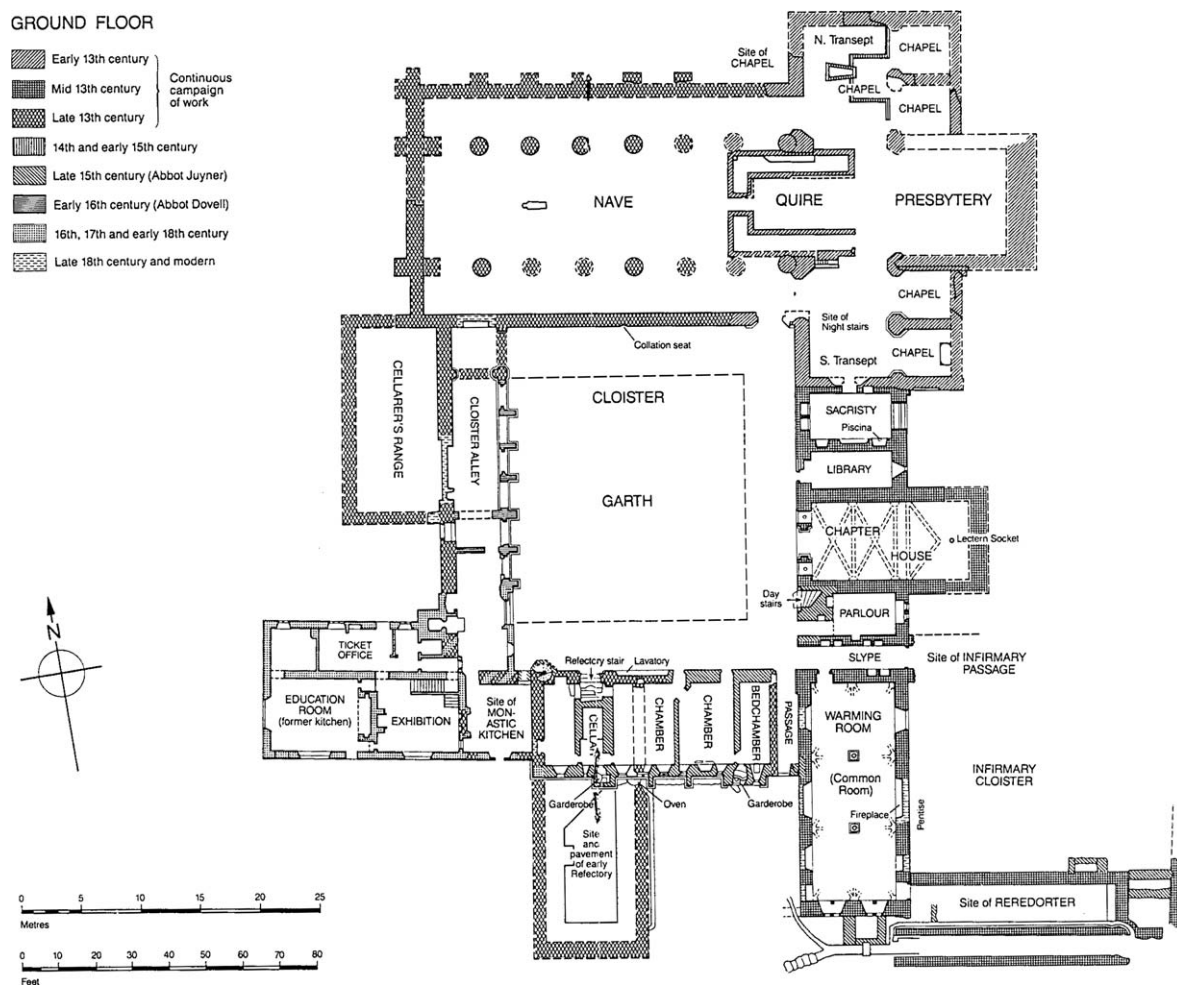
Ground floor plan of Cleeve Abbey (after Gilyard-Beer 1990, p. 26).
